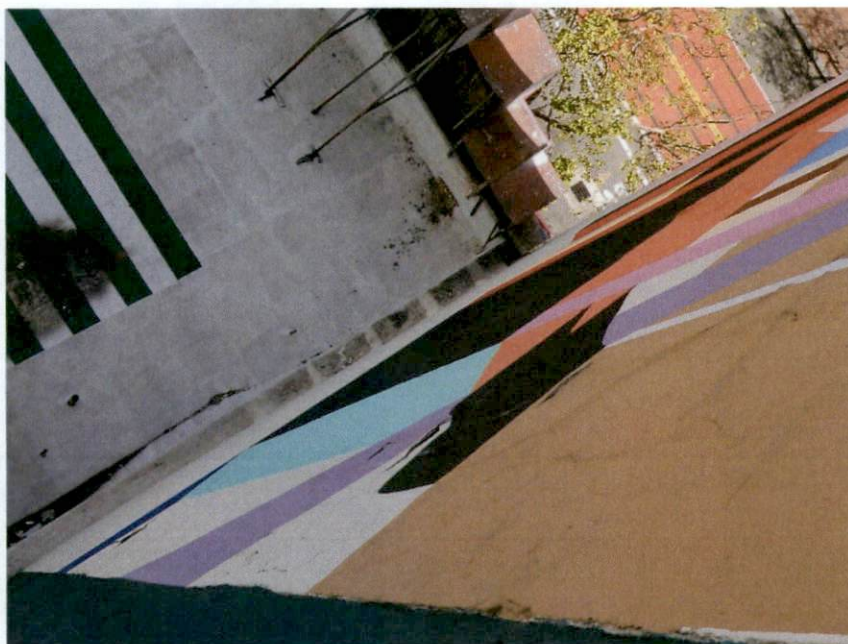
Photo L: Detail view of eastern cement plaster façade, looking southwest.
